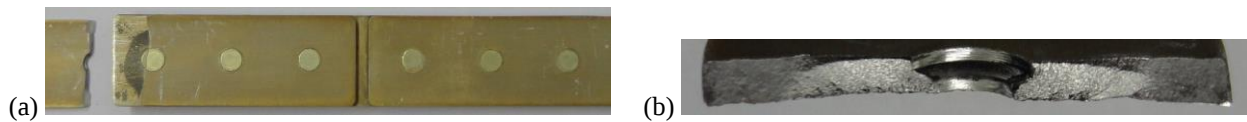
Specimen IA-19 (130 MPa): (a) fracture SH-OP; (b) fractured cross-section
